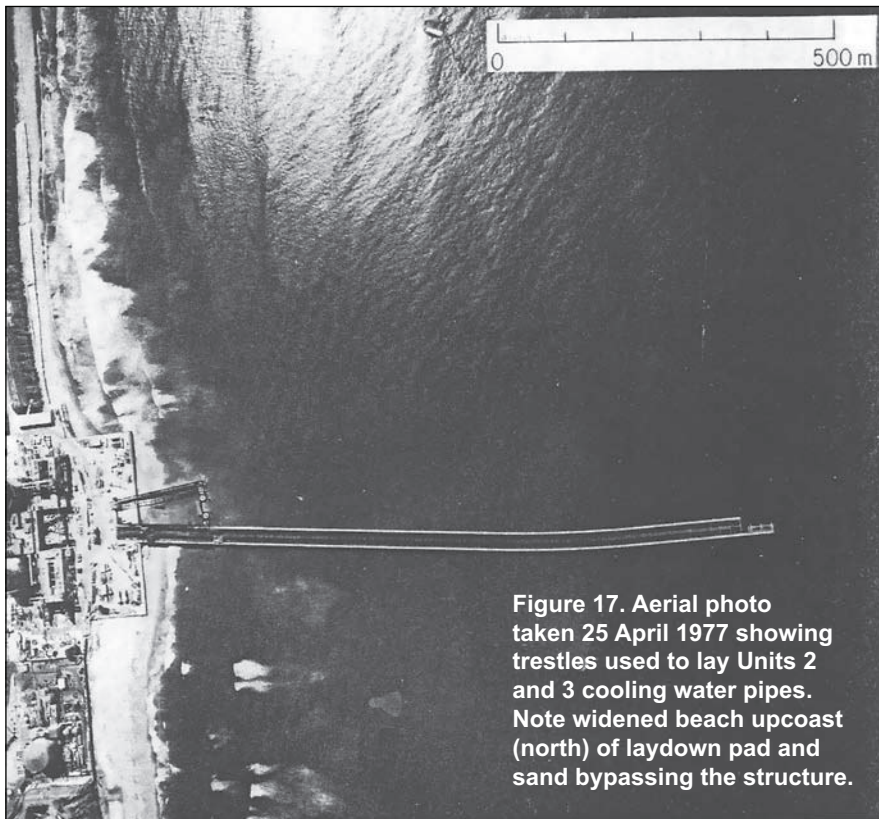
Aerial photo taken 25 April 1977 showing trestles used to lay Units 2 and 3 cooling water pipes. Note widened beach upcoast (north) of laydown pad and sand bypassing the structure.
